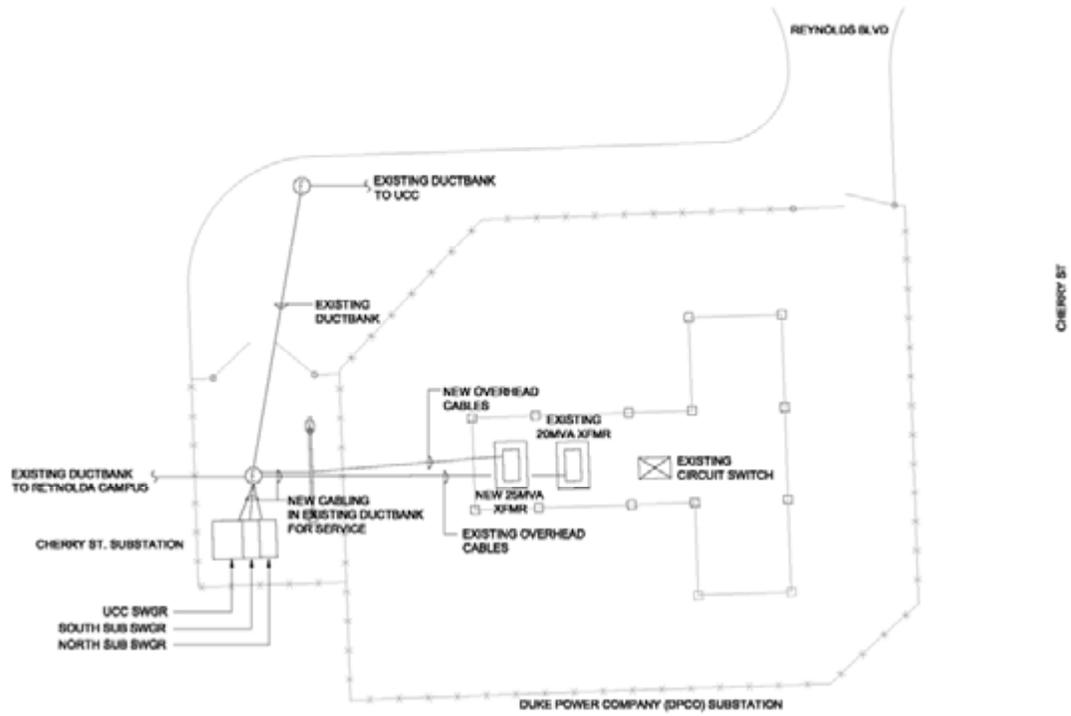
Option #1 Equipment Arrangement at Cherry Street Substation.
